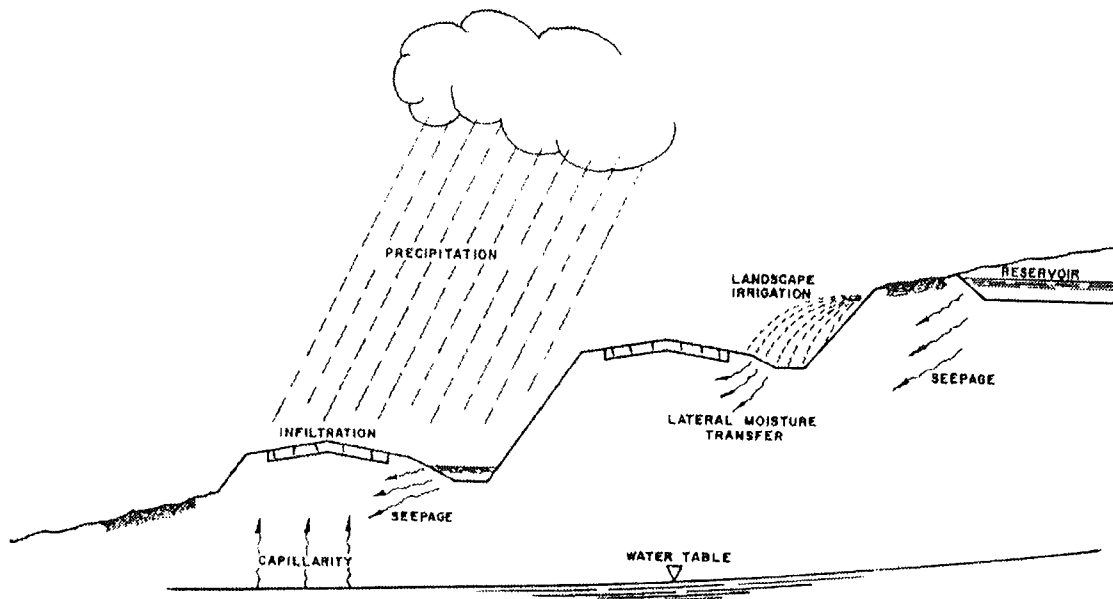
Sources of moisture in the pavement structure (FHWA, 1973).
